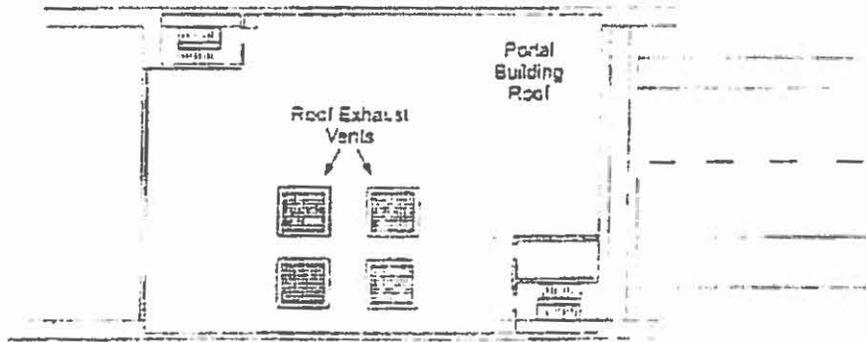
Tunnel air is drawn up into the exhaust vents located on the ceilings of both tunnels. It is then discharged at each portal building roof.
